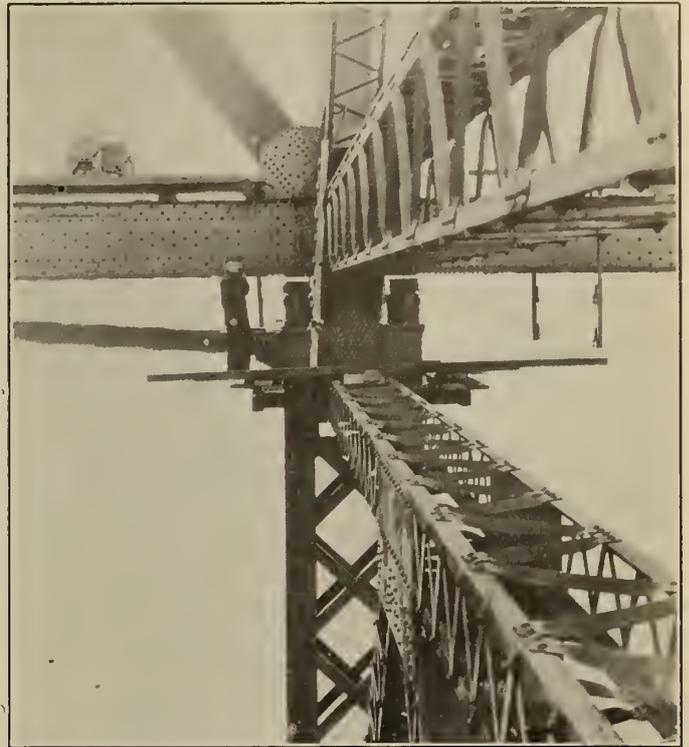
Main Span, South Side—Arrangement for jacking of Falsework Span at *AL7*.
